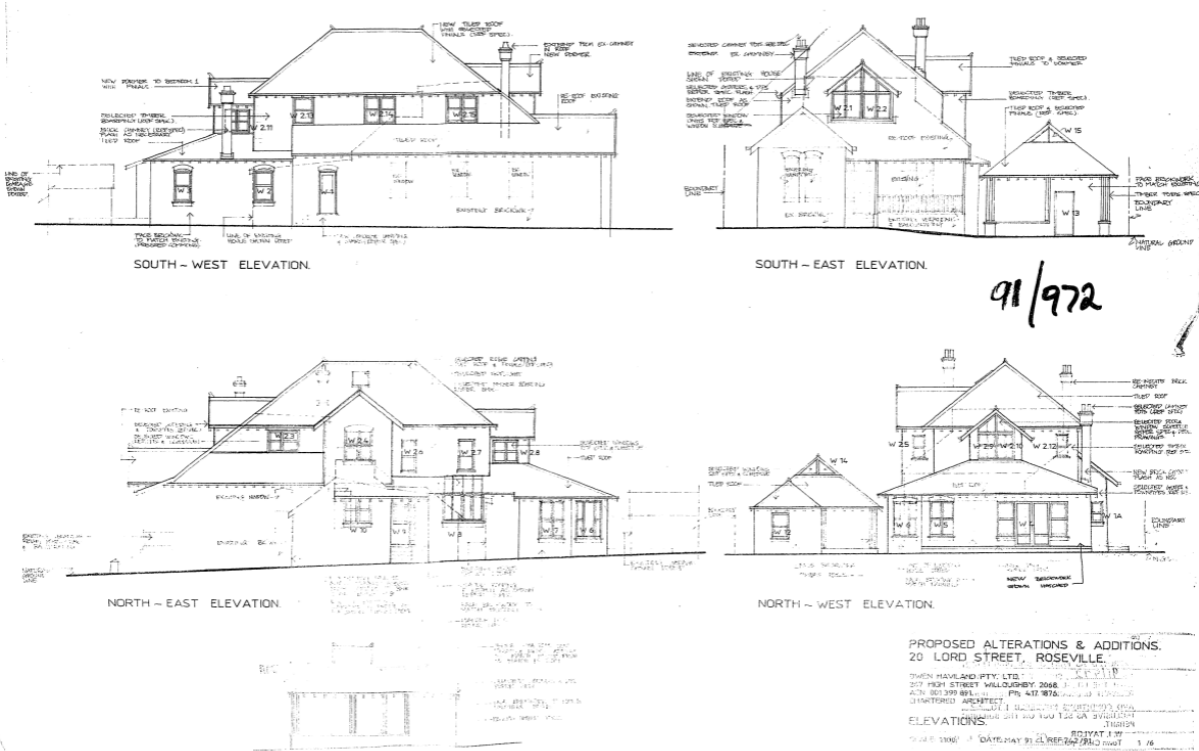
Elevations for proposed alterations and additions to dwelling dating from 1991
